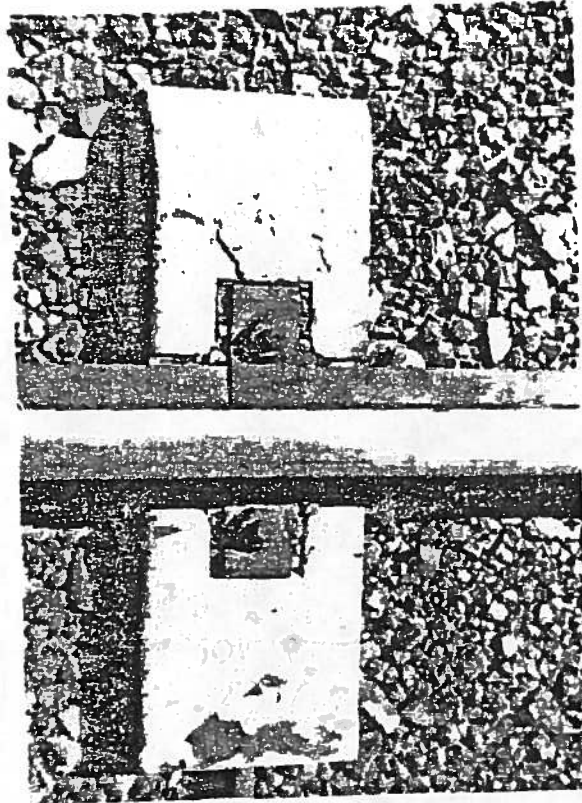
DAMAGE TO CONCRETE AT SEAT OF RAIL CLIP CAUSED BY SLACK IN FASTENING
